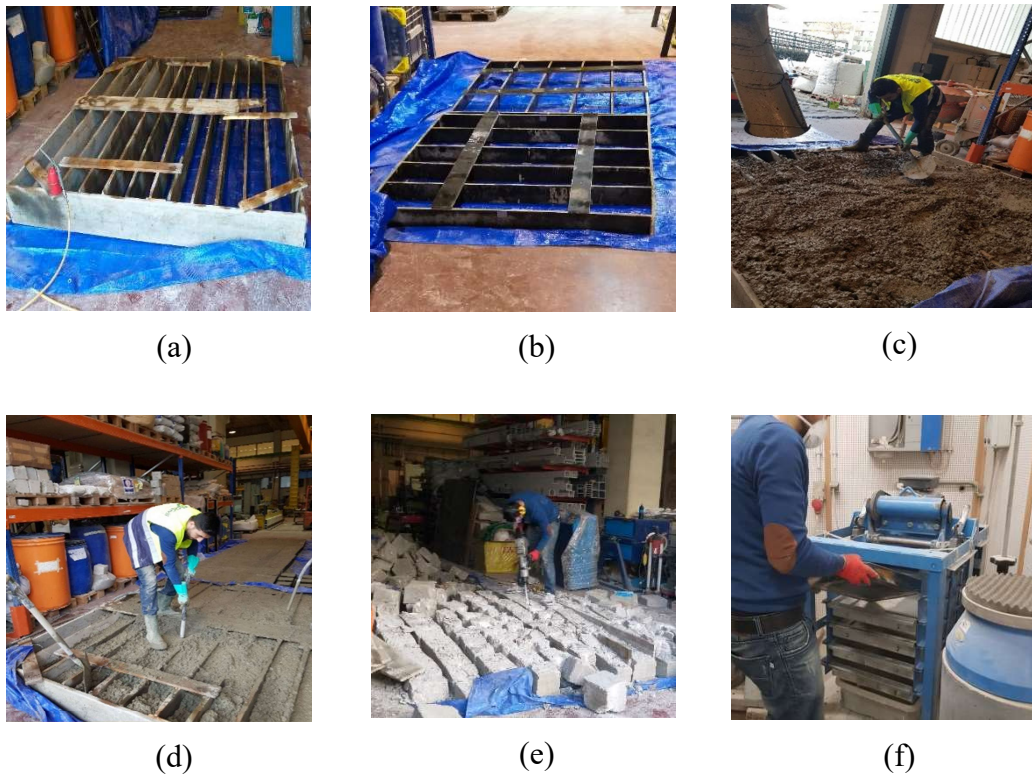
Casting process of the source concrete and producing RCA; Wooden formwork(a)&(b); Casting (c); Vibrating the source concrete (d); Dividing source concrete in blocks (e); and sieving machine (f)
